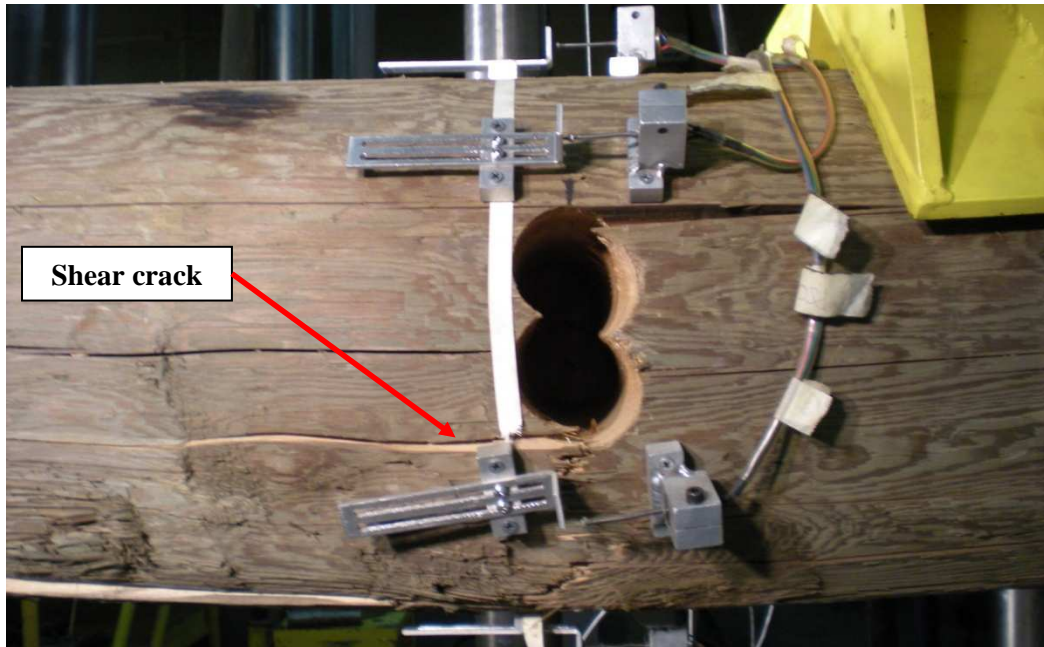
Shear failure of new pole specimen with neutral axis nesting damage (55-2-3).
